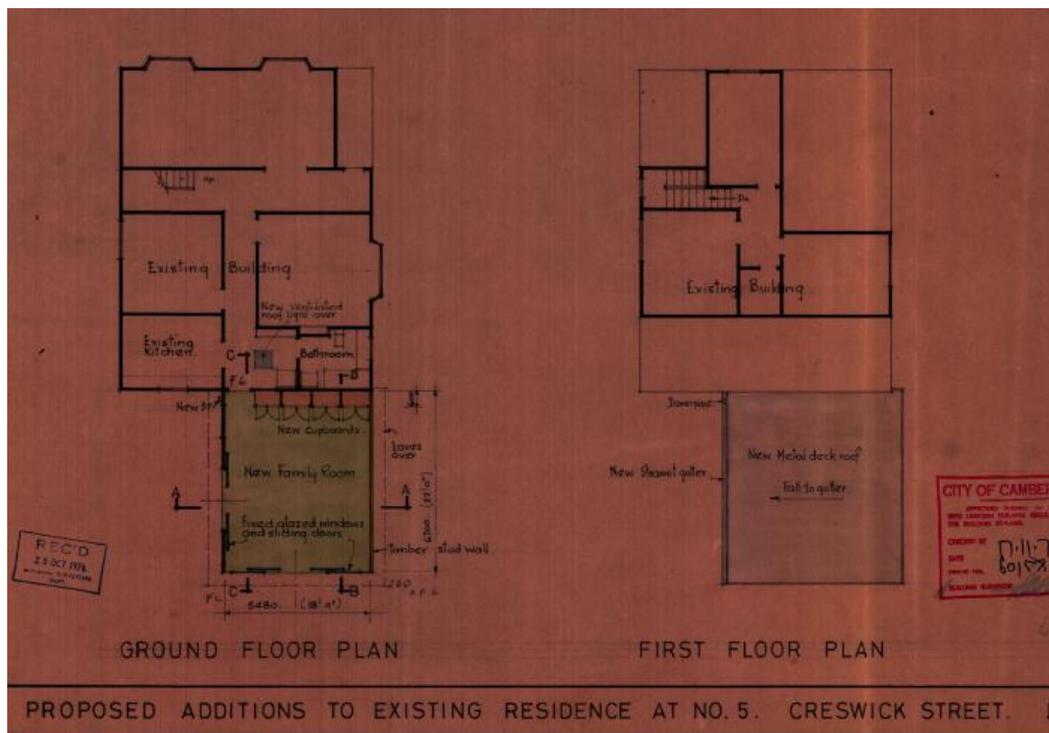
Drawing by A. F. Colafella Pty Ltd Consulting Engineers, depicting the proposed extension to 5 Creswick Street, Deepdene. The City of Camberwell approved the drawings in 1976 and issued Building Permit No. 60158. (Source: Boroondara City Council)
